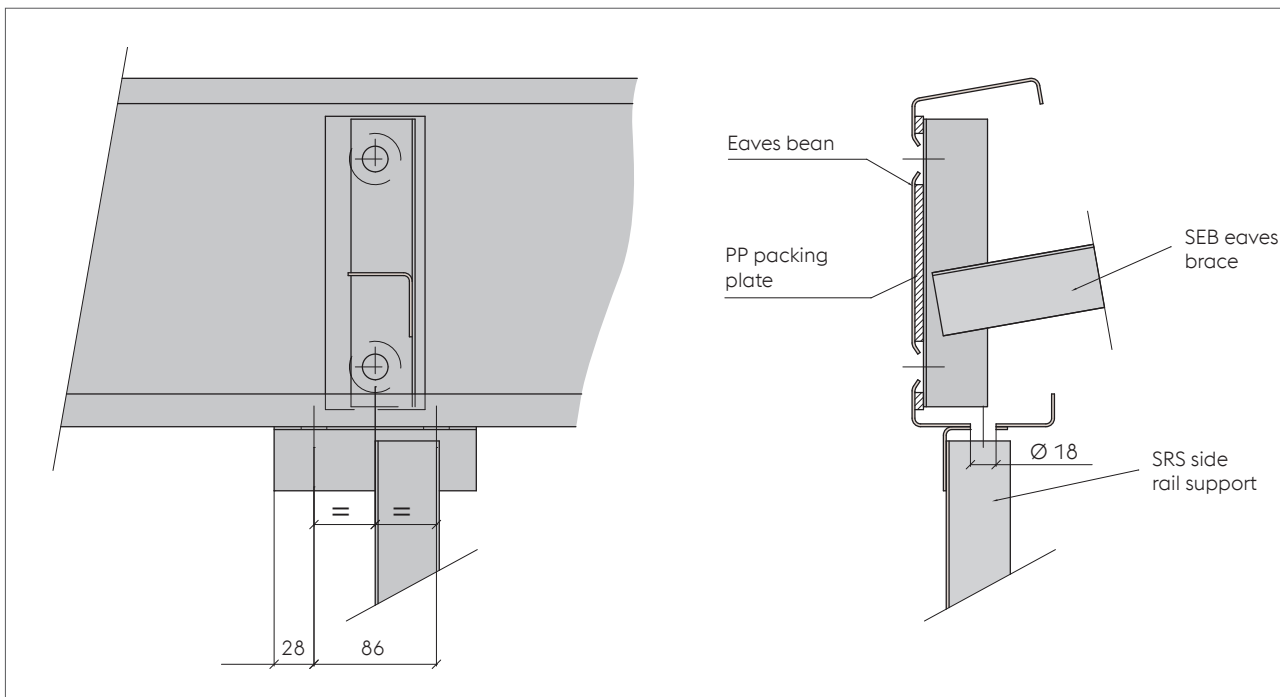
Detail of the eaves beam at the joint with the eaves brace
